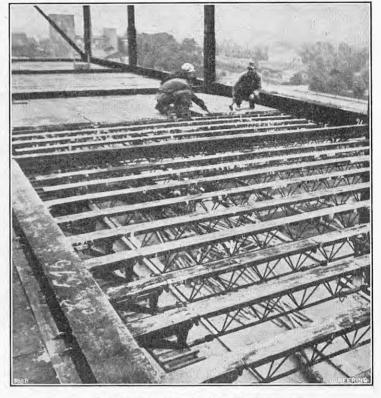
TYPICAL LAYOUT OF CENTRING.
